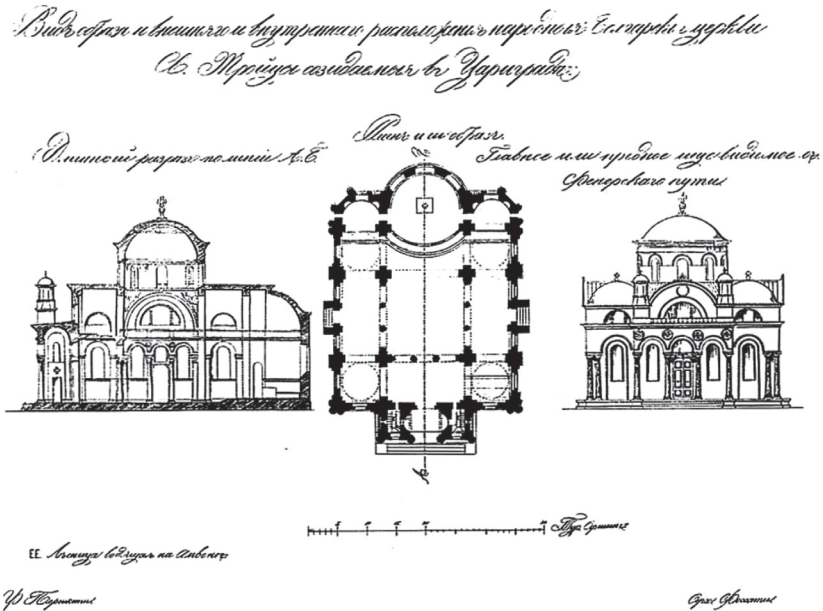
Fossati brothers project for a masonry temple at the Golden Horn of 1859. Longitudinal section, plan and west façade. Preserved at the Historical and Archive Institute at the Bulgarian Patriarchy.
